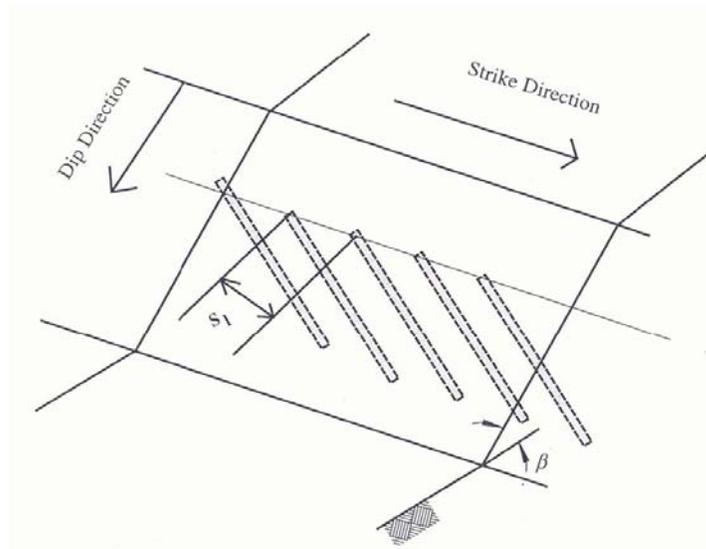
Slope reinforced with a single row of reinforcing members spaced equally in the longitudinal (strike) direction (after Liew, 2000).
